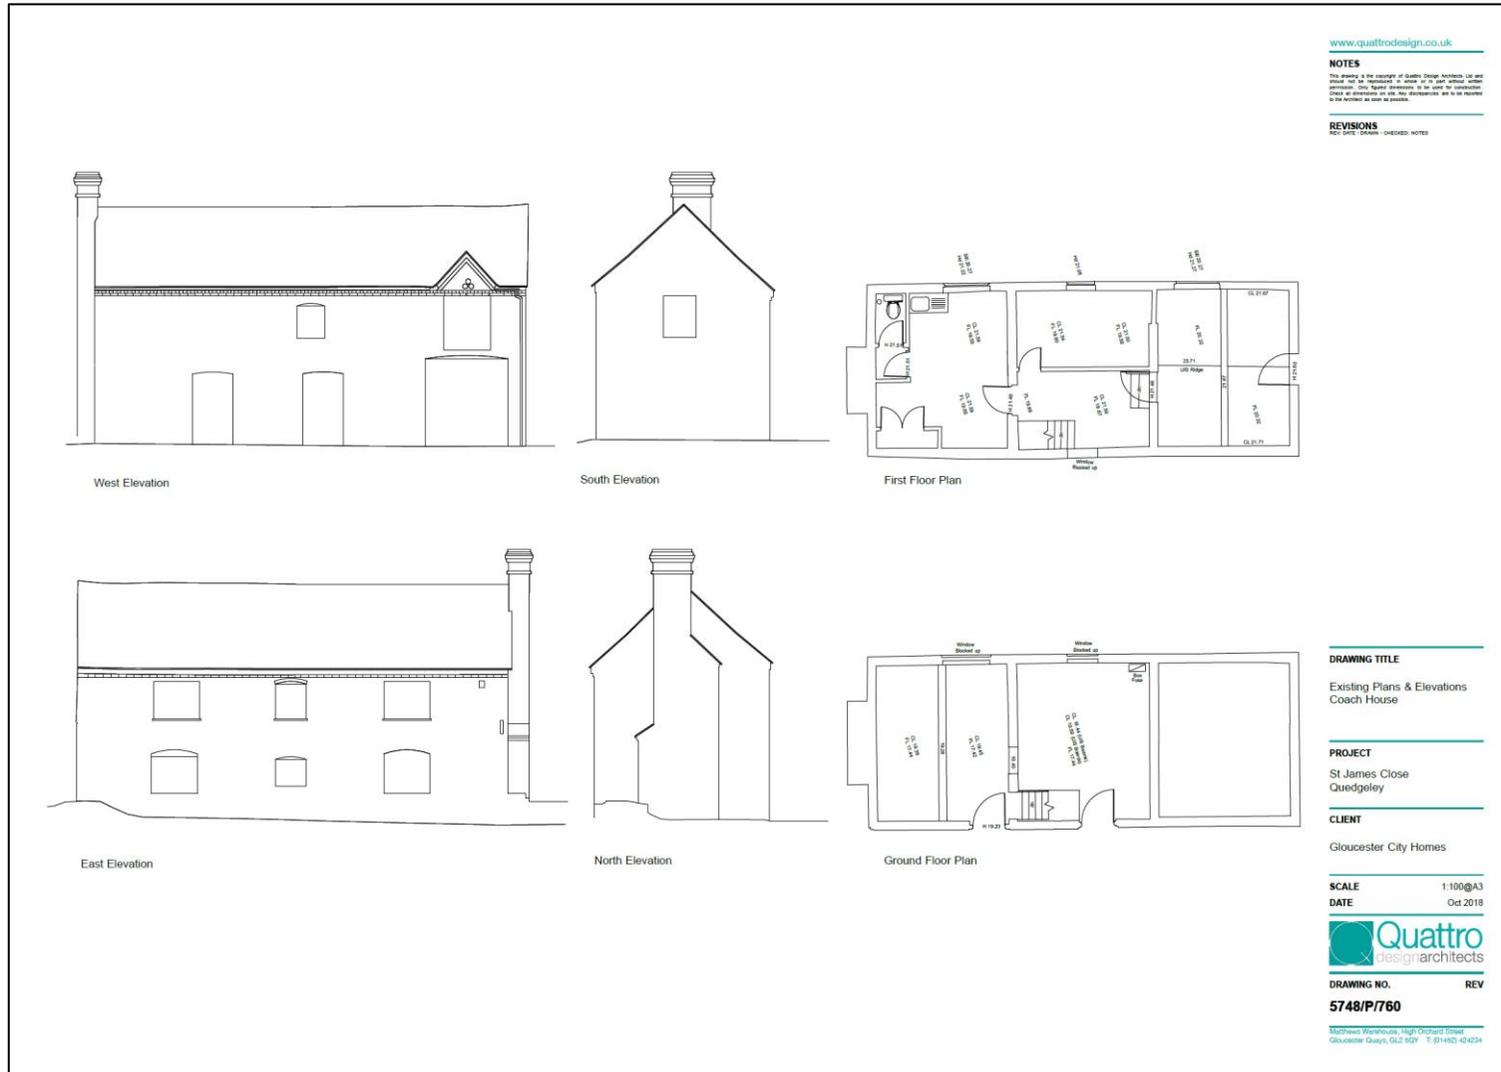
Plans and elevations of the Old Coach House as existing (Reproduced courtesy of Quattro Design Architects)
